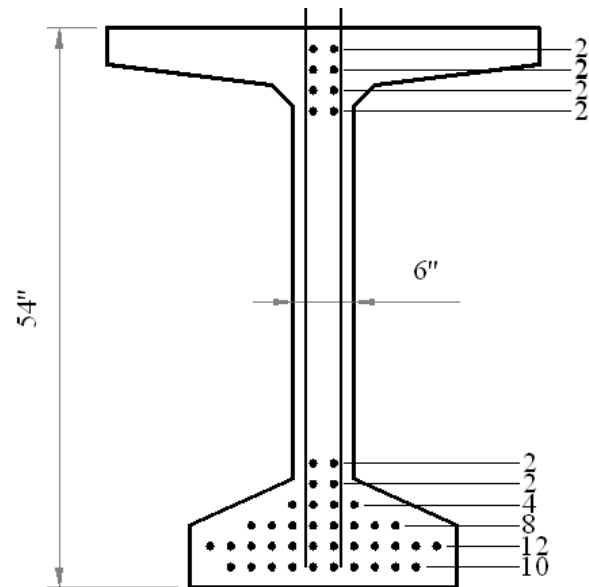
End View Cross-Section of Four BT-54 Girders with 48 - 0.7 in. (18 mm) Strands Employing UHPC.
